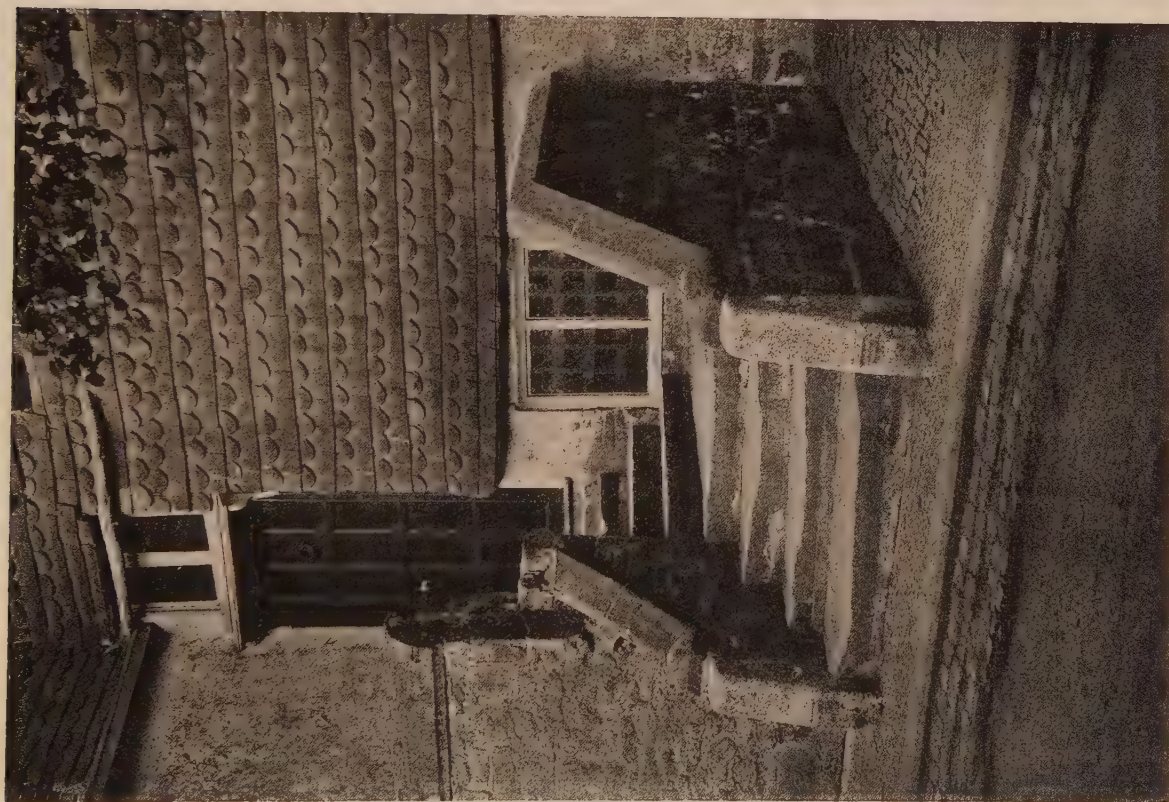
FISH TAIL TILE HANGING, COURSED STONEWORK AND STUCCO COMBINE TO GIVE A PLEASANT CONTRAST (SURREY).
